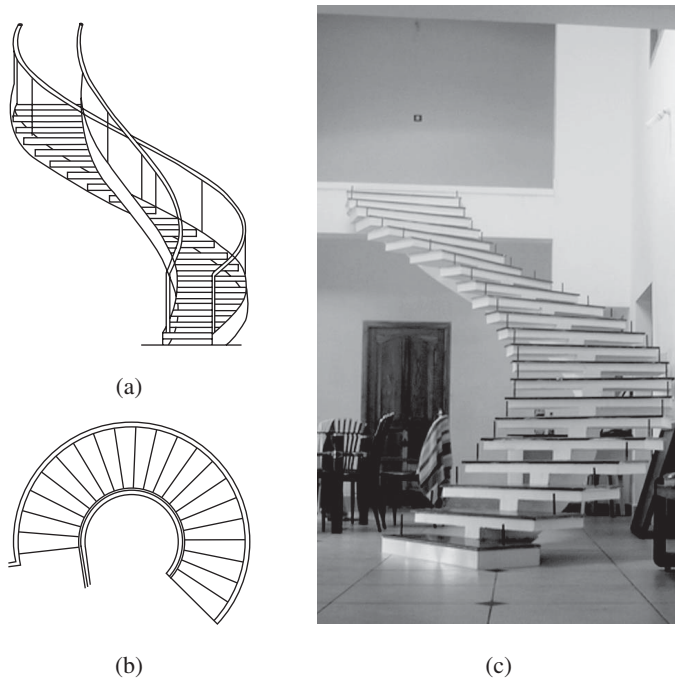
Helicoidal staircase (a) Elevation (b) Plan (c) In a hospital-cum-residence in Panruti, Tamil Nadu
